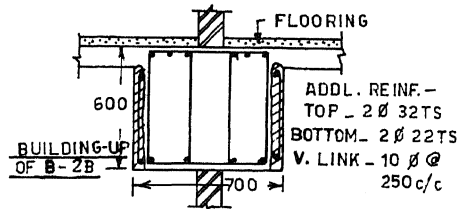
JACKETING OF BEAM AND BUILDING UP OF COLUMN - CASE II
